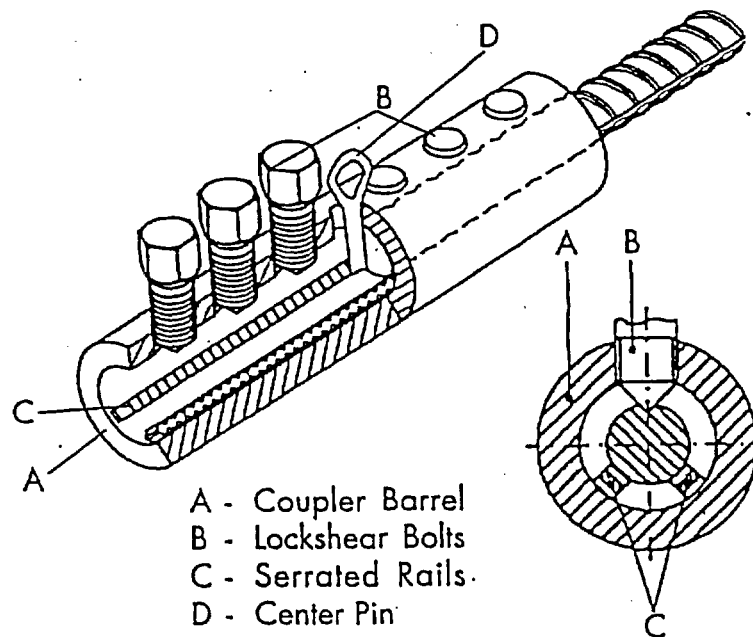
Bar-Lock Coupler Cutaway View Showing Internal Details
